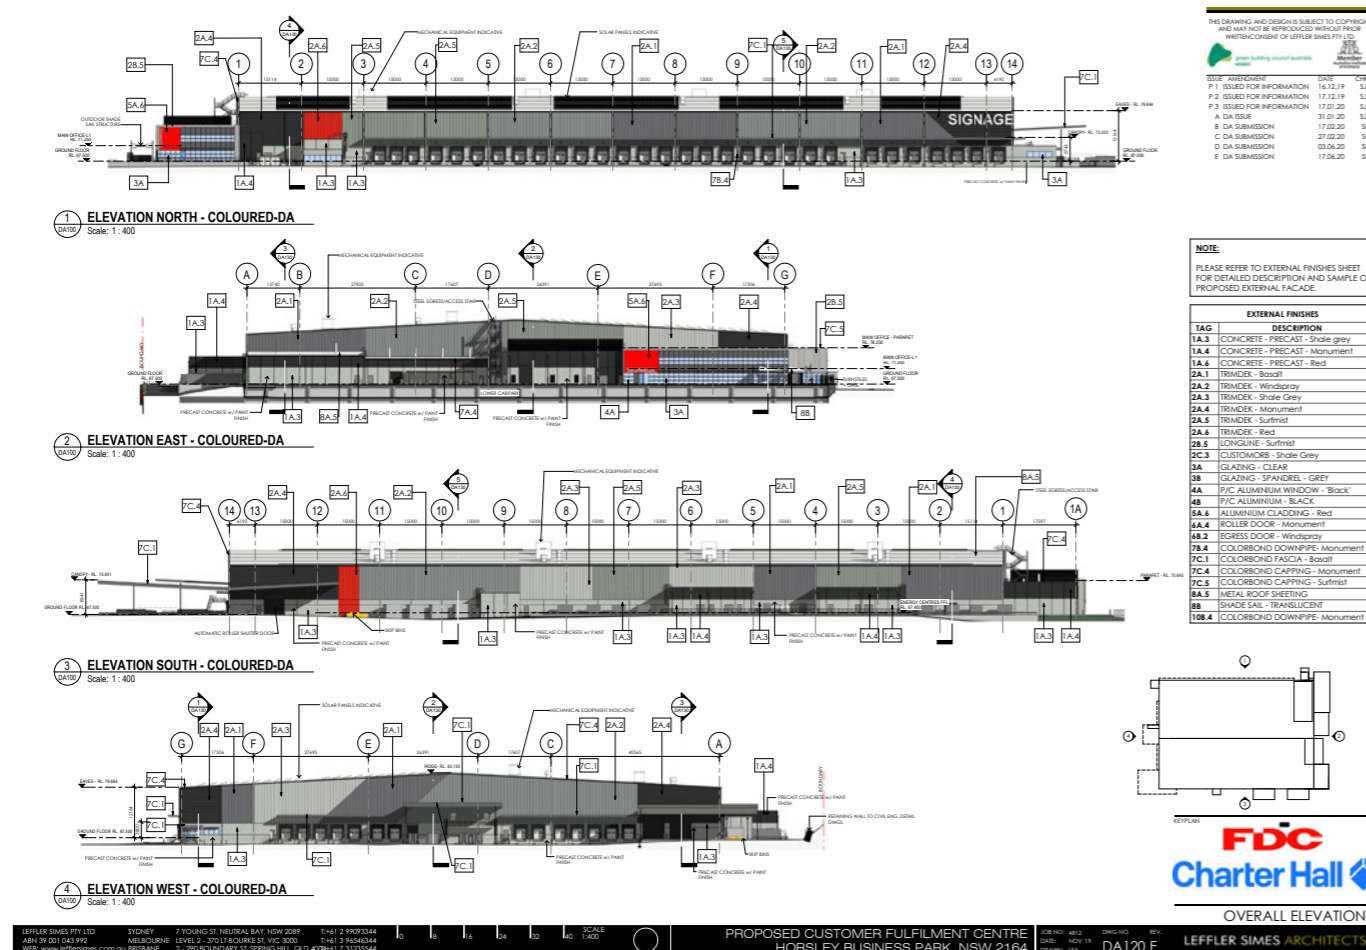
Approved Customer Fulfillment Centre SSD Elevations (Source: Leffler Simes Architects)
